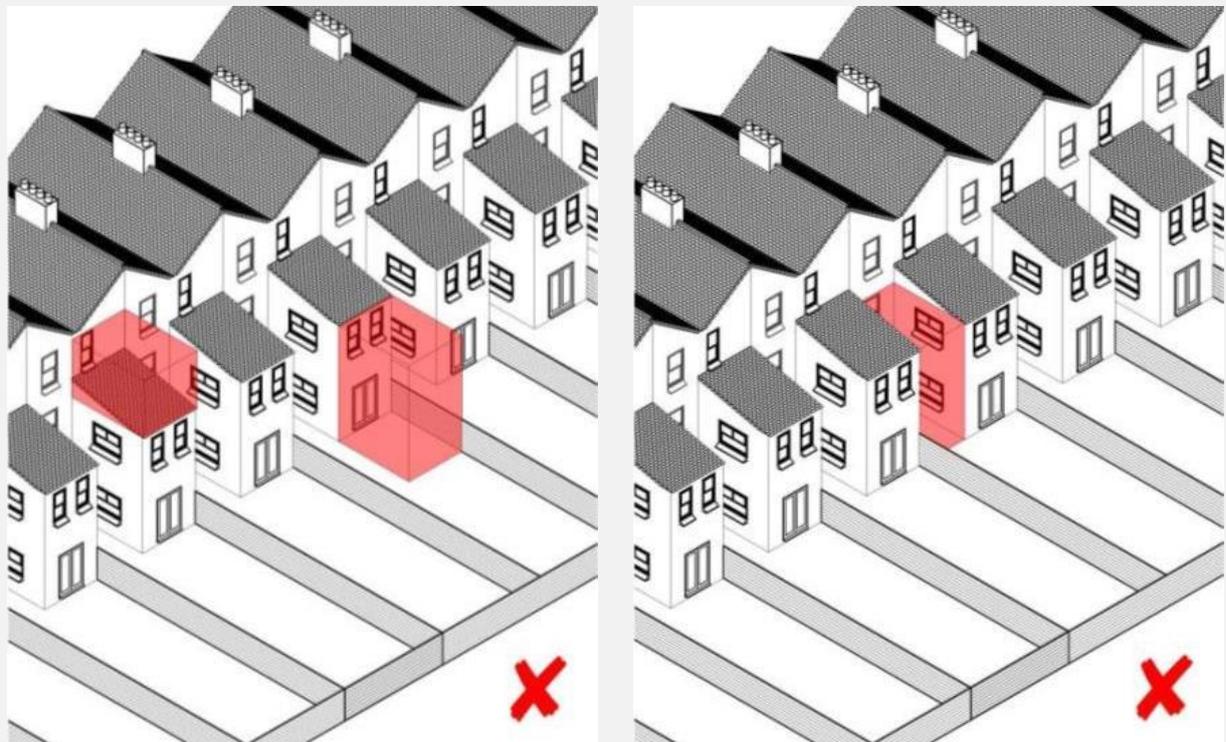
Upper floor extensions that project out beyond the existing line of the rear projection or extend up to the line of the roof parapet/eaves normally disrupt the rhythm/unity of the terrace. In rear elevations that have a consistent arrangement, extensions above the existing rear projections will normally be resisted. Where they project above upper ground floor level, rear infill extensions within the lightwell area can undermine the rhythm of the terrace.
